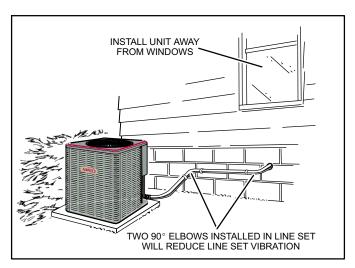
Outside Unit Placement PLACING OUTDOOR UNIT ON SLAB
